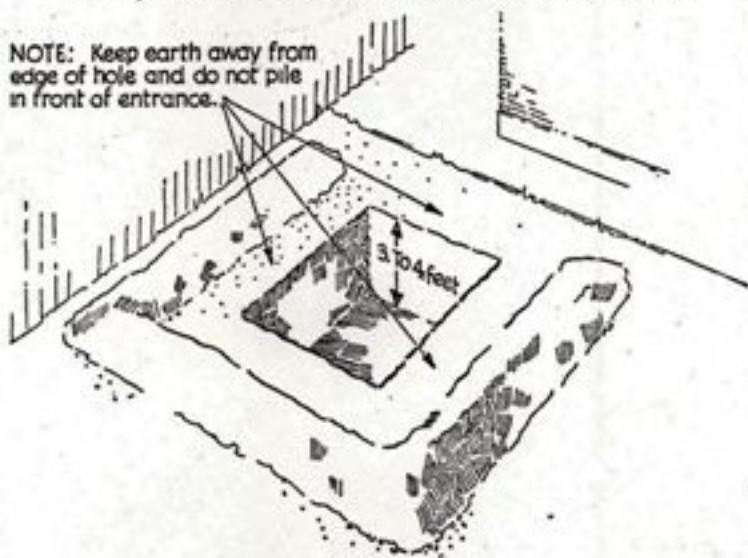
STAGE 2. HOLE DUG TO FINAL DEPTH.
